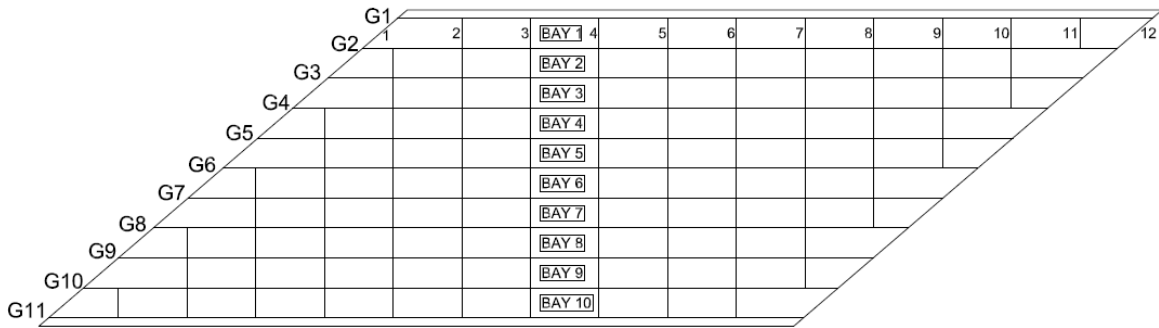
Girder, bay, and cross-frame numbering for Bridge 1.
